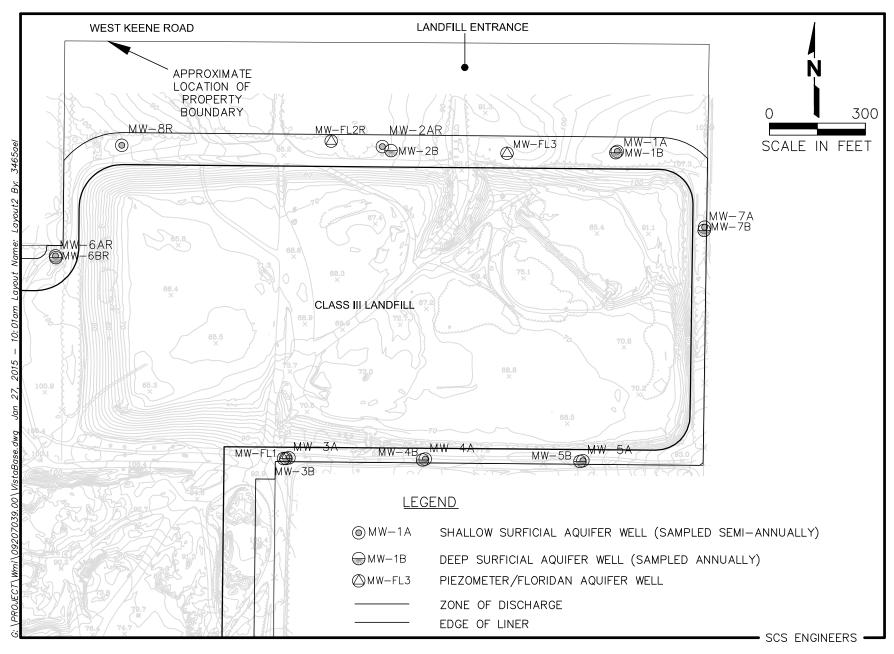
Site Map, Vista Landfill, Apopka, Florida.
